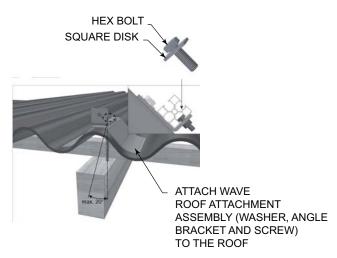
Attach Wave Roof Attachment Assembly and Hex Bolt
